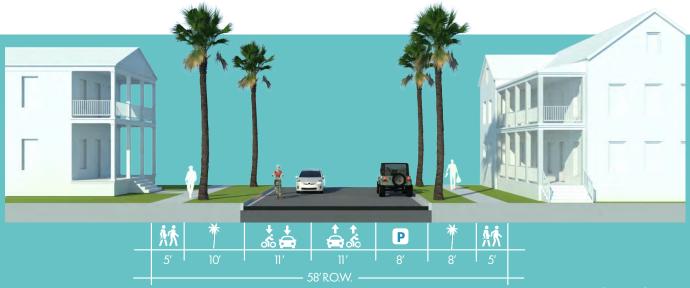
Atlantic Boulevard Proposed Street Sections
